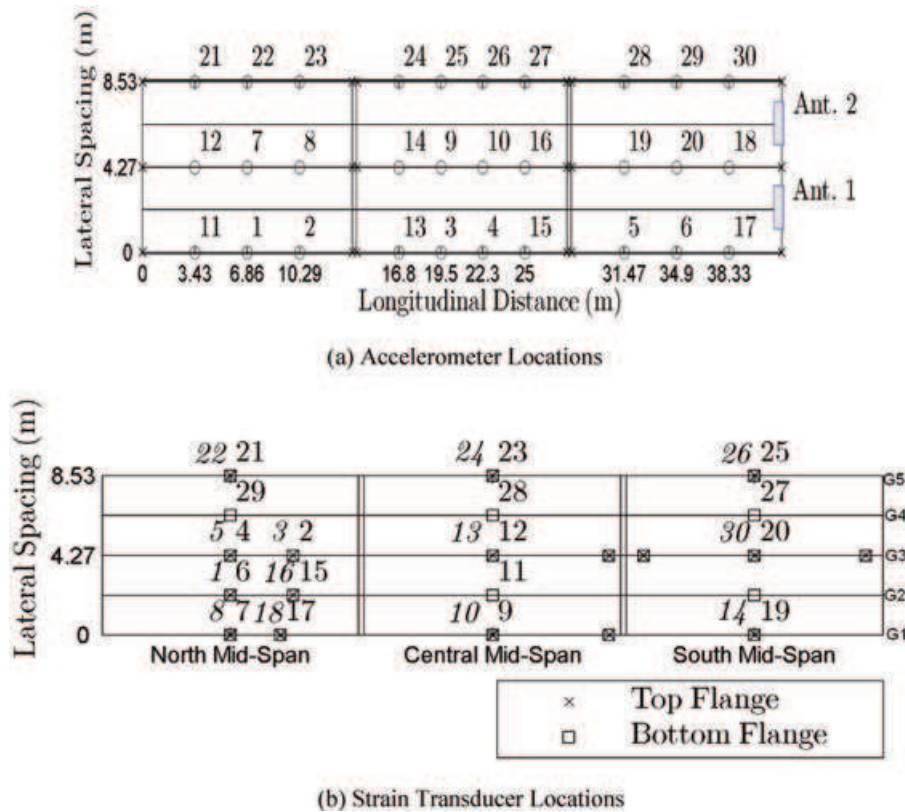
Instrumentation layout for testing performed at the RT345 Bridge site.
